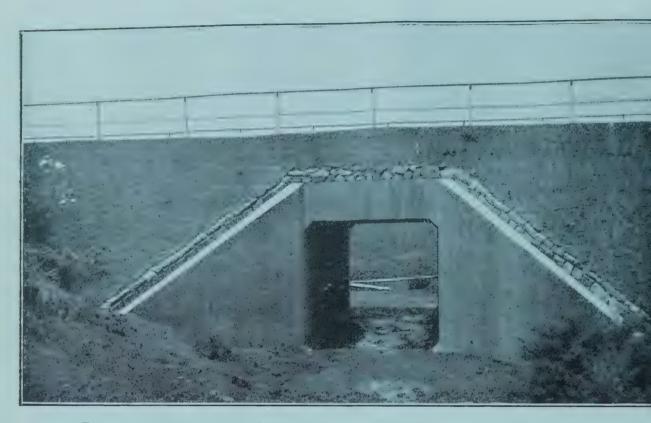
REINFORCED CONCRETE CULVERT REPLACING BURNED BRIDGE. Showing reinforced concrete culvert, 10 feet by 10 feet, at site of burned bridge. The bridge was 40 feet in length.
